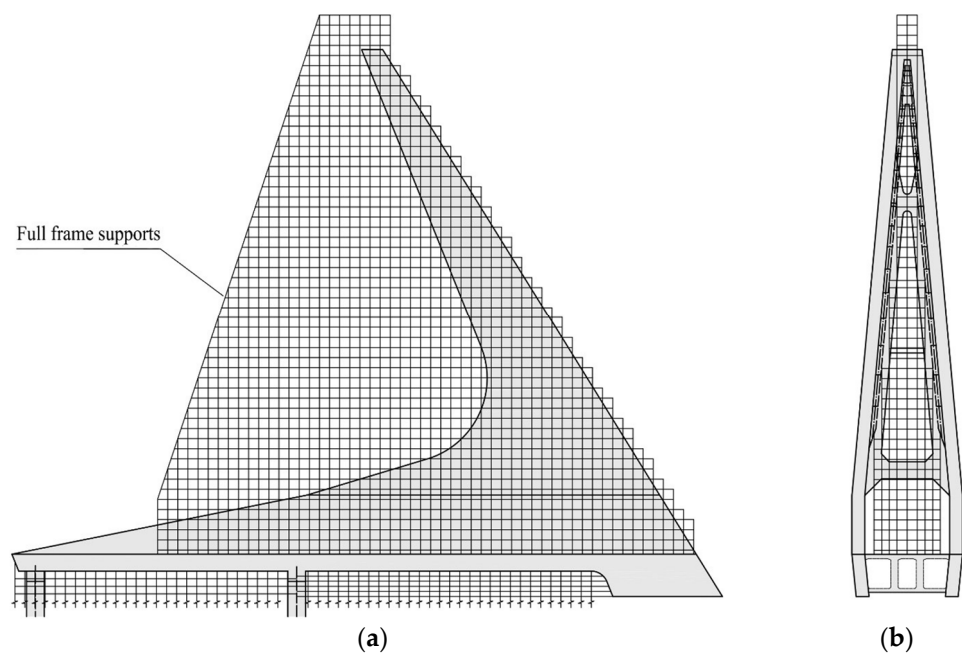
Layout of full frame supports during pylon construction: (a) elevation; (b) pylon section.
